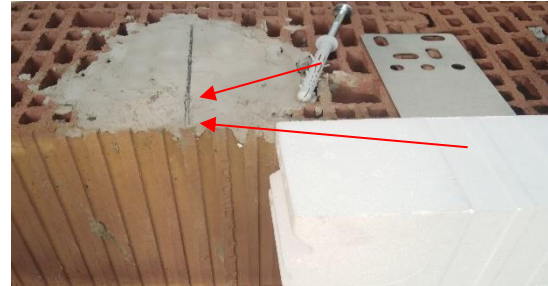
Reinforcement of foundation load-carrying ability in CBM bracket plate locations through pouring mortar into structural clay tiles
